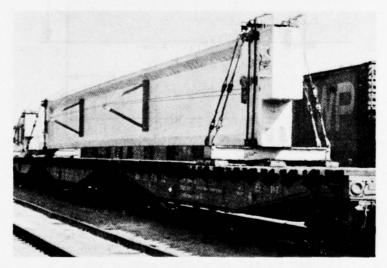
Long girder transported by rail cars (courtesy of American Concrete Institute⁵⁹)
